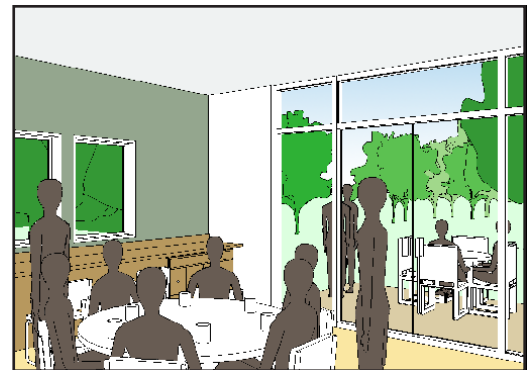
View of peer mentoring meeting room with access to an adjacent outdoor terrace.
